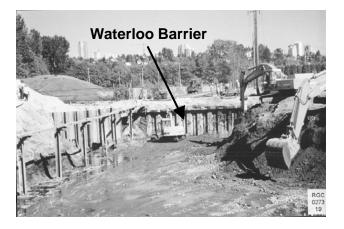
Soil excavation adjacent to Waterloo Barrier.
